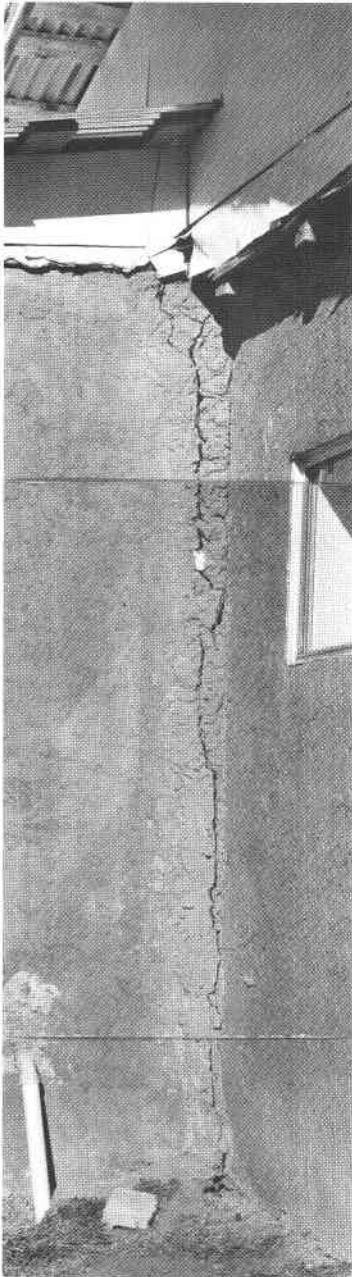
Crack in exterior wall of adobe house that the owner has repaired without lasting success.
